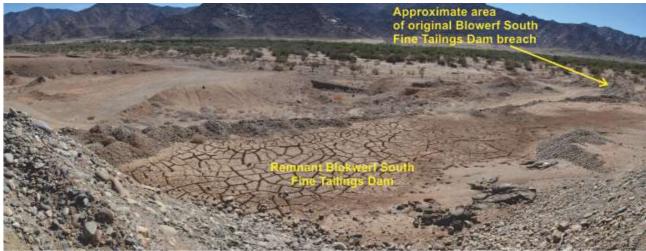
Looking down at the Blokwerf South Fine Tailings Dam. Note that the breach has been cleared.
